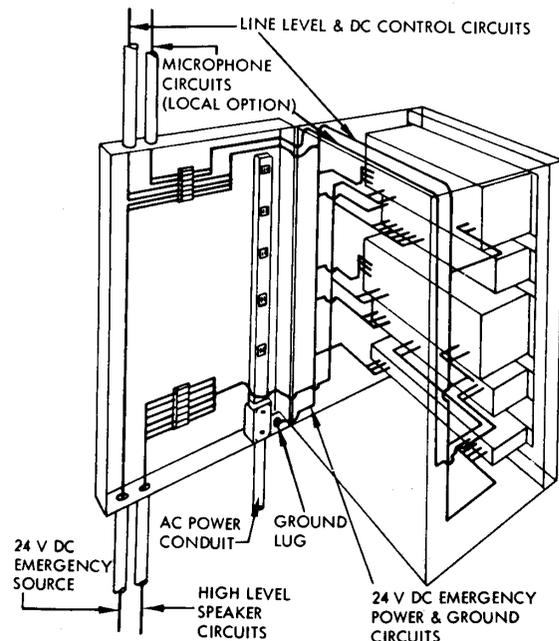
Cable Routing in Equipment Rack. (Reprinted from Sound System Engineering by Don & Carolyn Davis published by H. W. Sams Co.)
